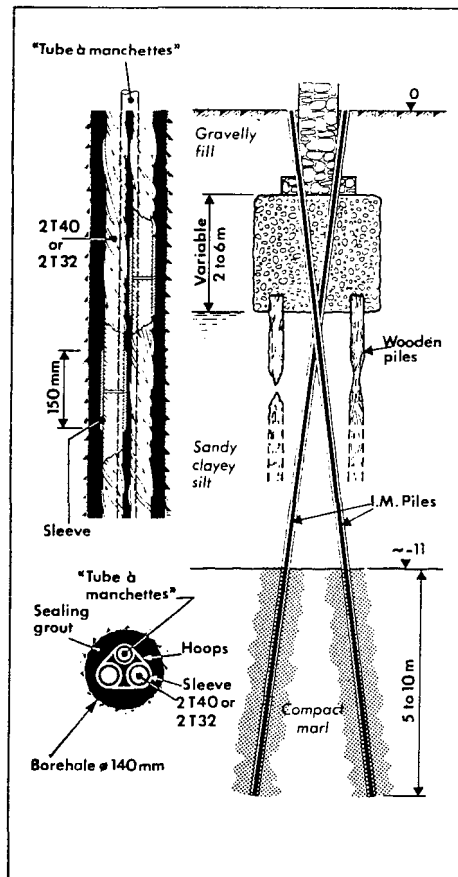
Typical cross section and details, Marseille Law Courts, France (Soletanche, 1986).
